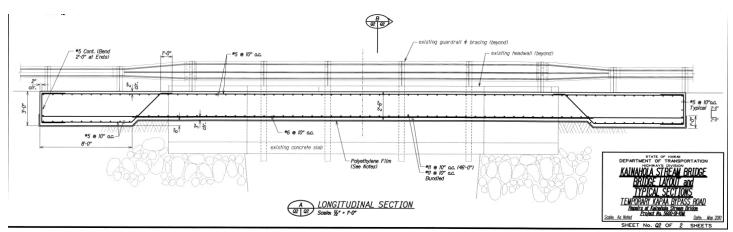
Diagram showing new bridge superstructure. Source: Kainahola Stream Bridge, Bridge Layout and Typical Sections, Temporary Kapaa Bypass Road, Repairs at Kainahola Stream Bridge, Project No. 5600-01-10M, 2010.
